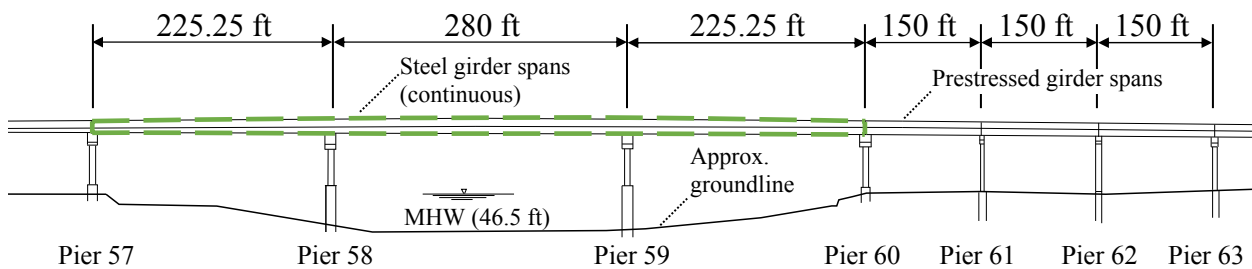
Elevation schematic of SR-20 at Blountstown Pier 57 through Pier 63
